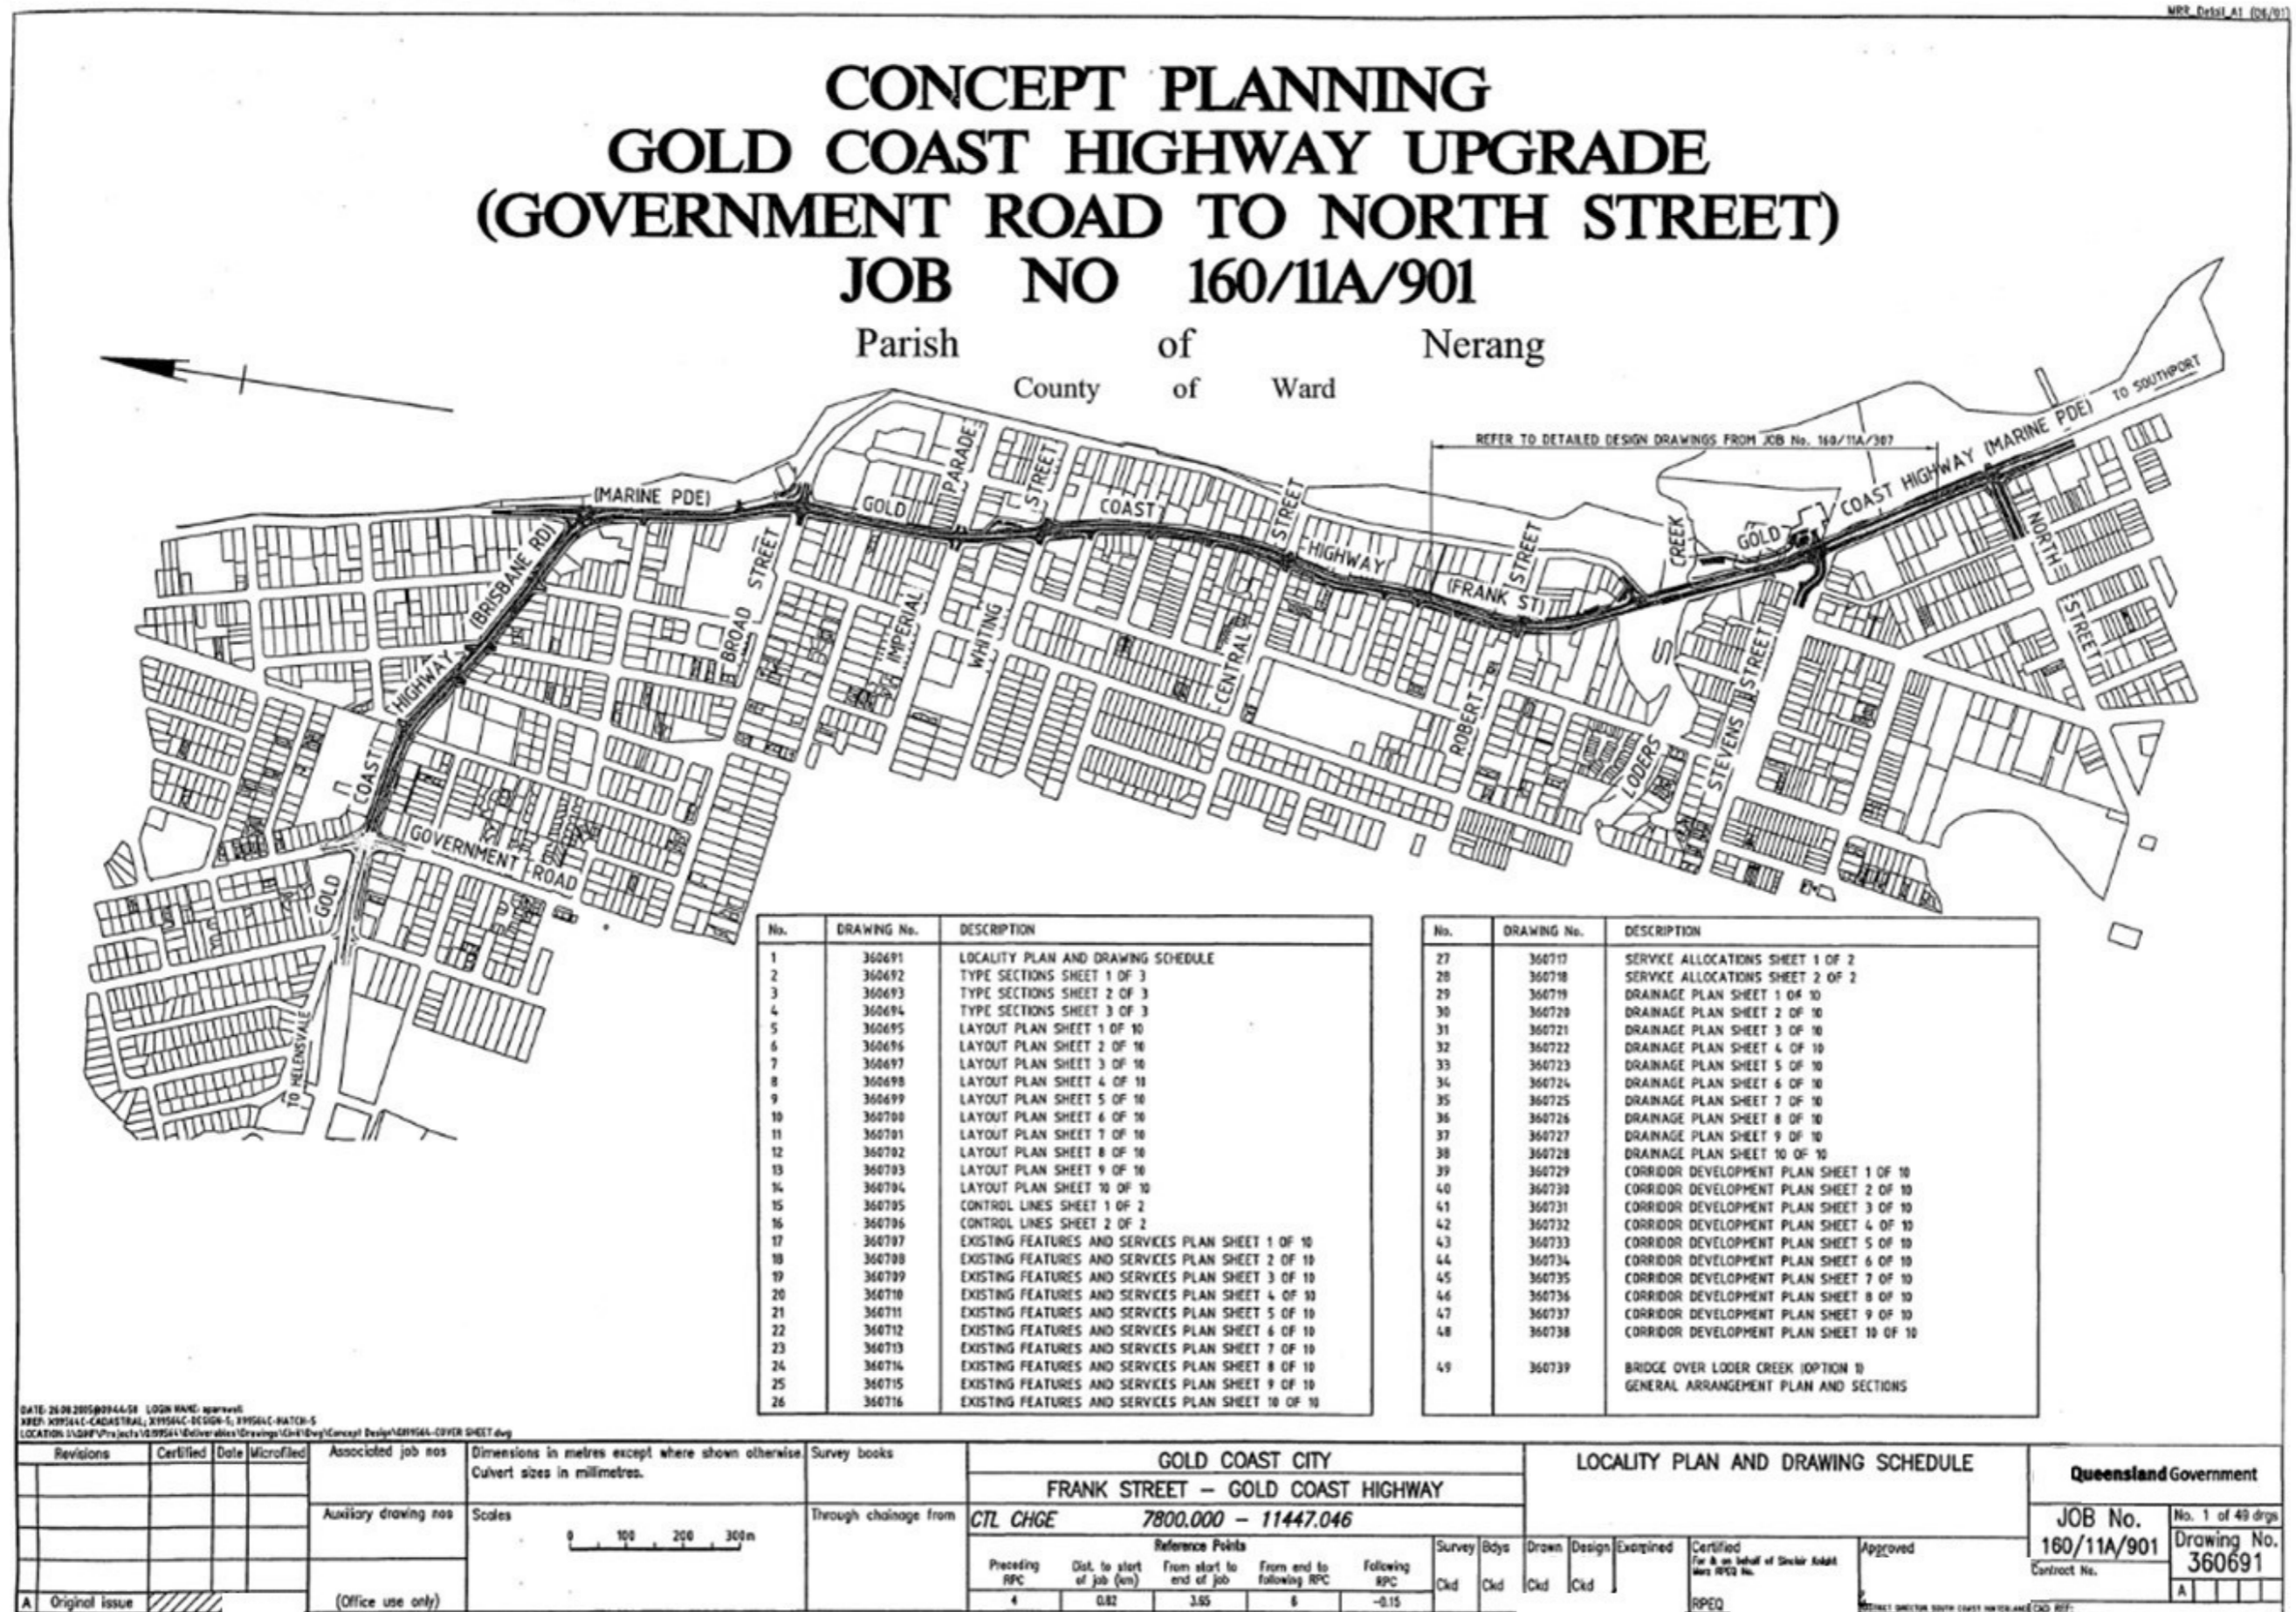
(c) – Locality plan and drawing list – registered example 2
